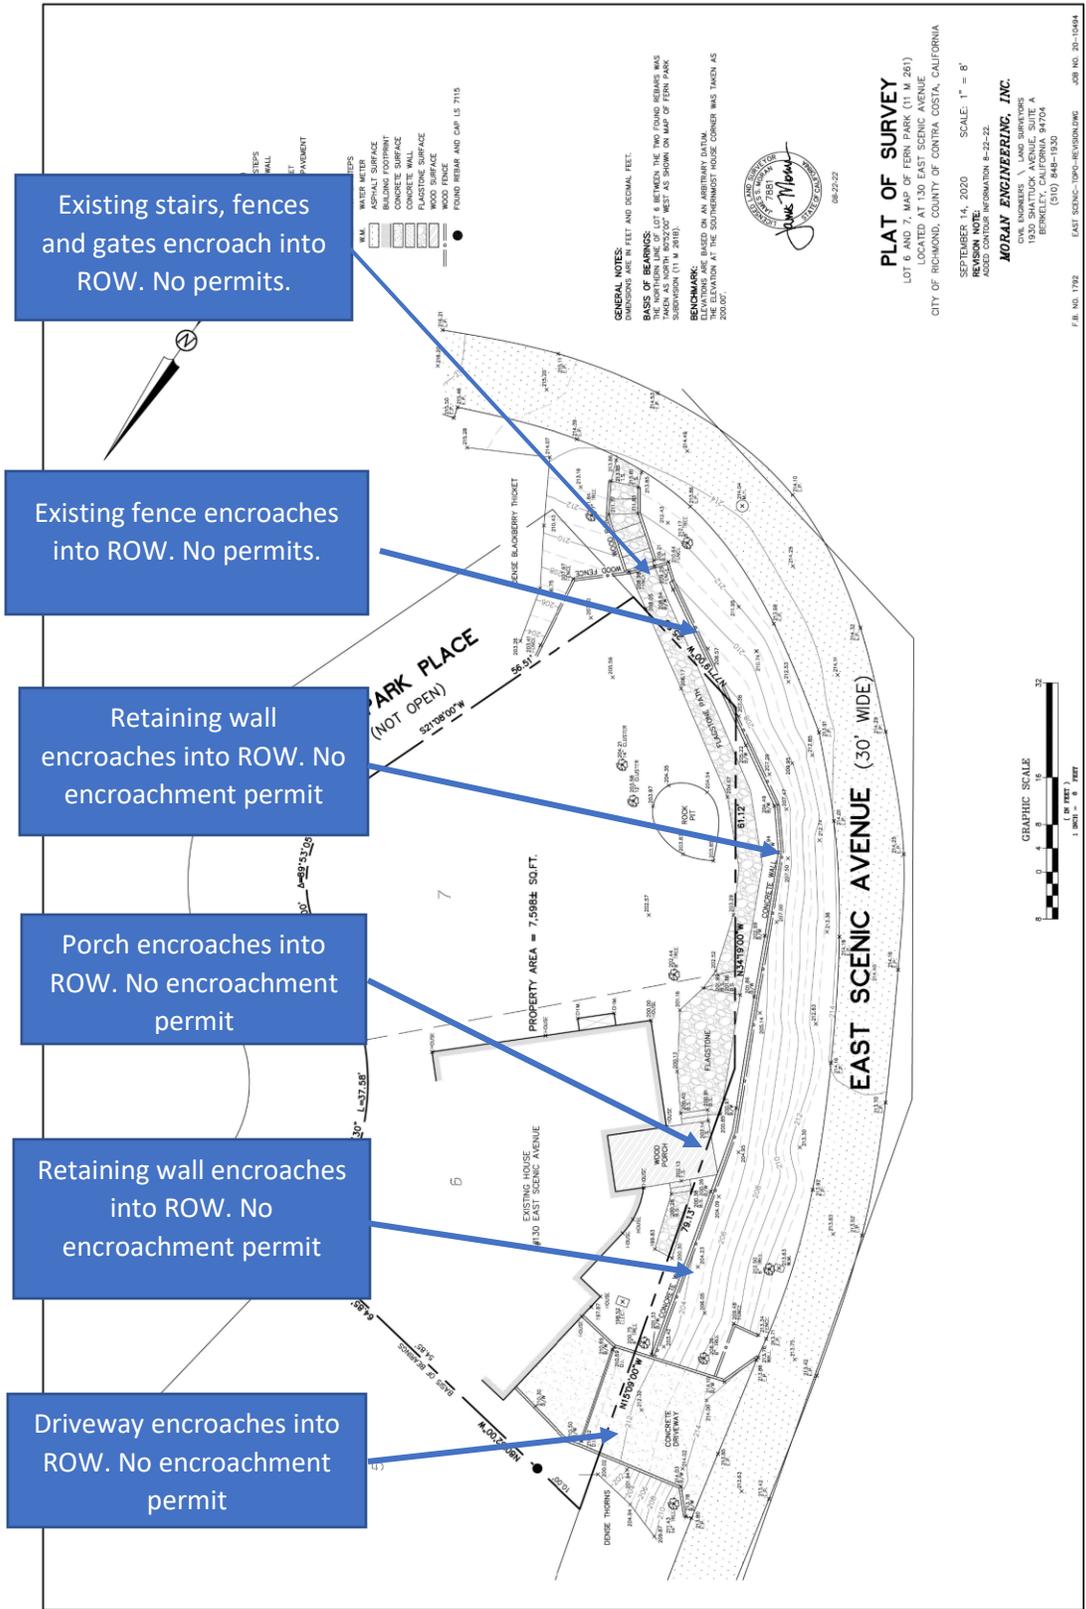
Multiple existing structures at 130 east Scenic Avenue encroach into ROW without permits
